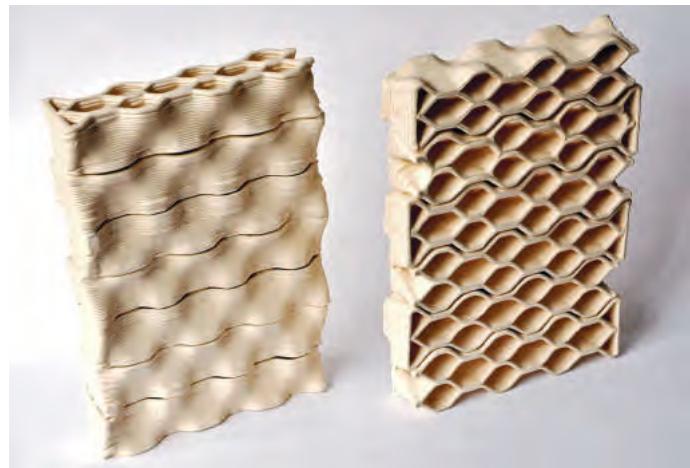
Honeycomb brick: full-scale wall prototypes.
